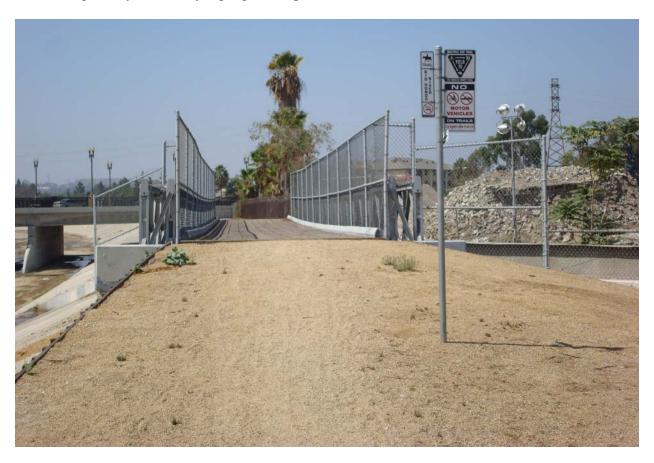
The Rubio Wash bridge access ramp looking southwest.
